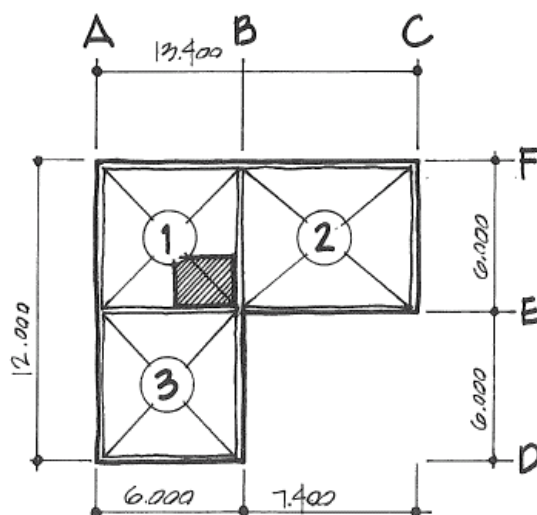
(b): Bracing Lines and Diaphragm Positions
